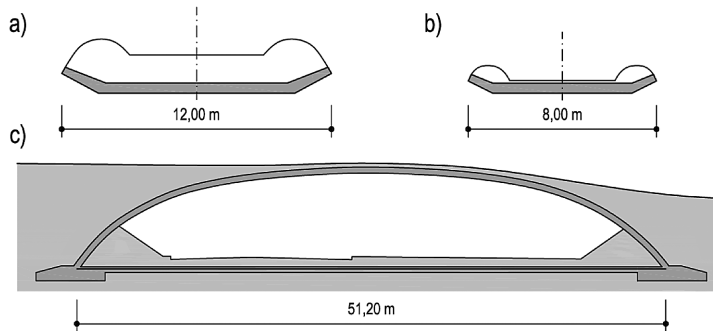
Cannstatter Street Pedestrian Bridge, Stuttgart, Germany.
